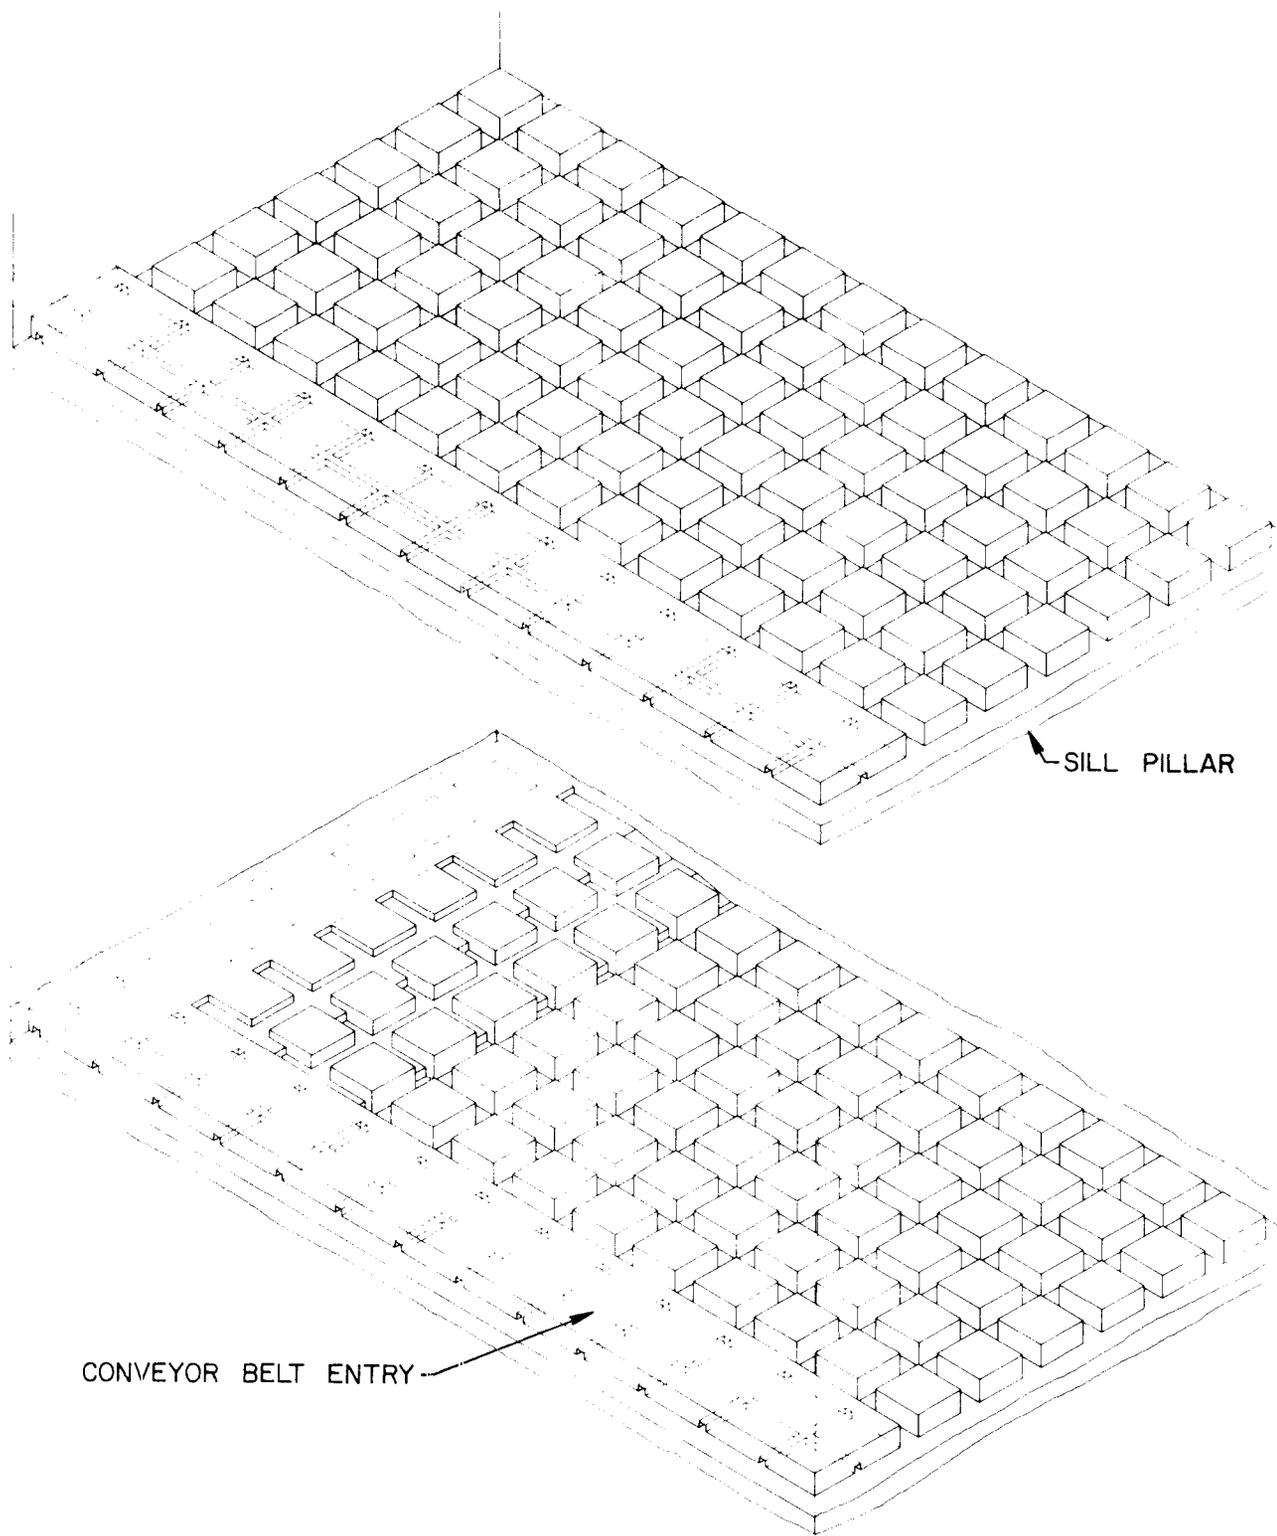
Isometric View, Advance Entry and Pillar Mining
